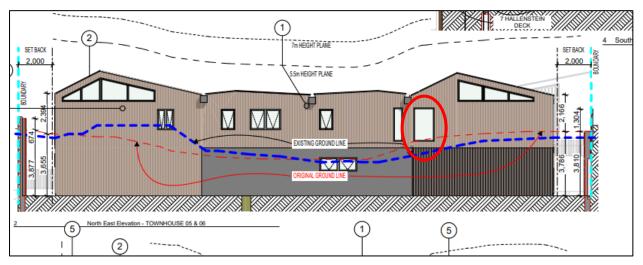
Proposed Plans of Townhouse 05 and 06 adjoining the southern boundary of the site
